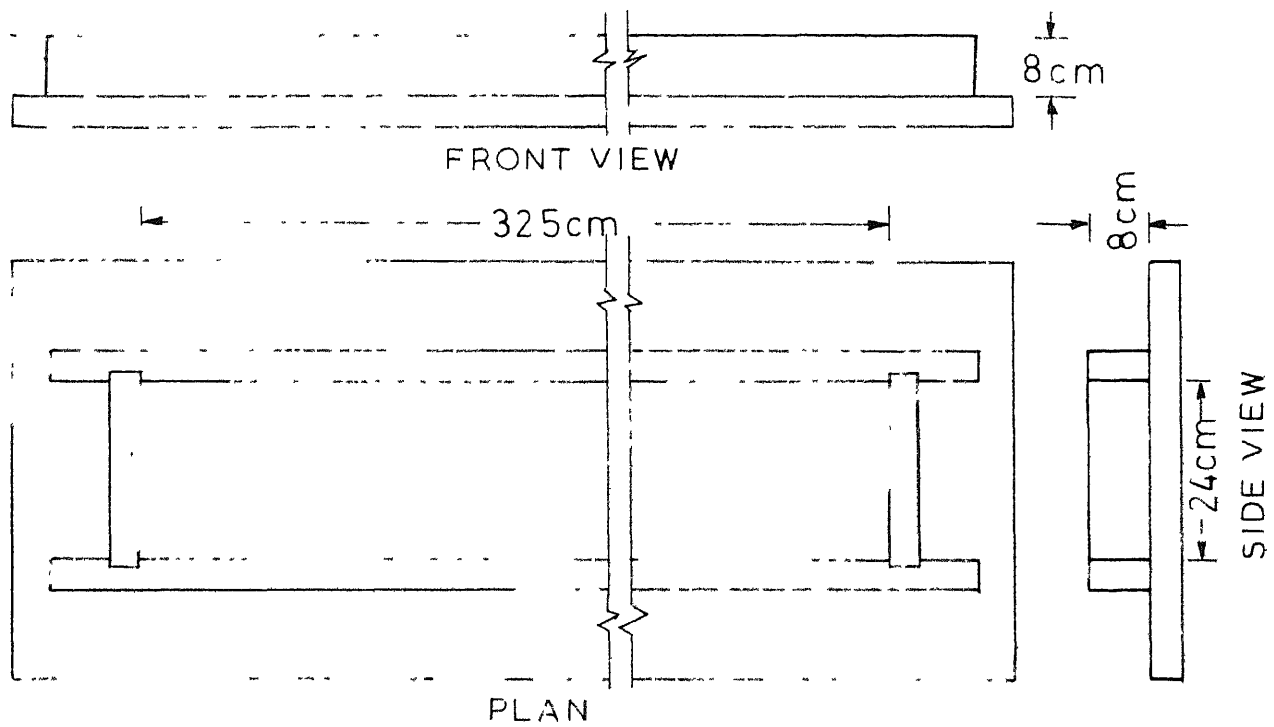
(a) Mould for casting R.C. beams (Compressive loading)
